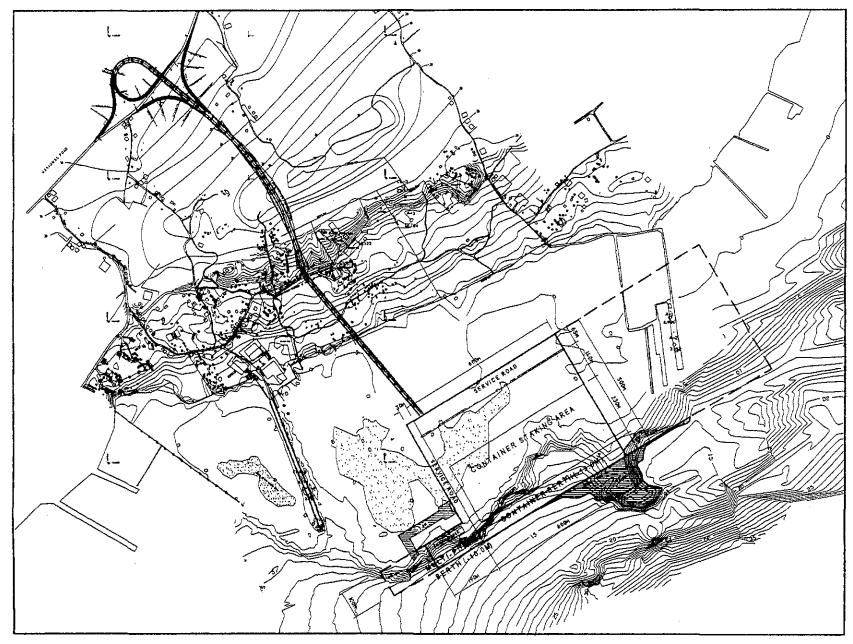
Short-term Development Plan of New Cebu Port (1)
